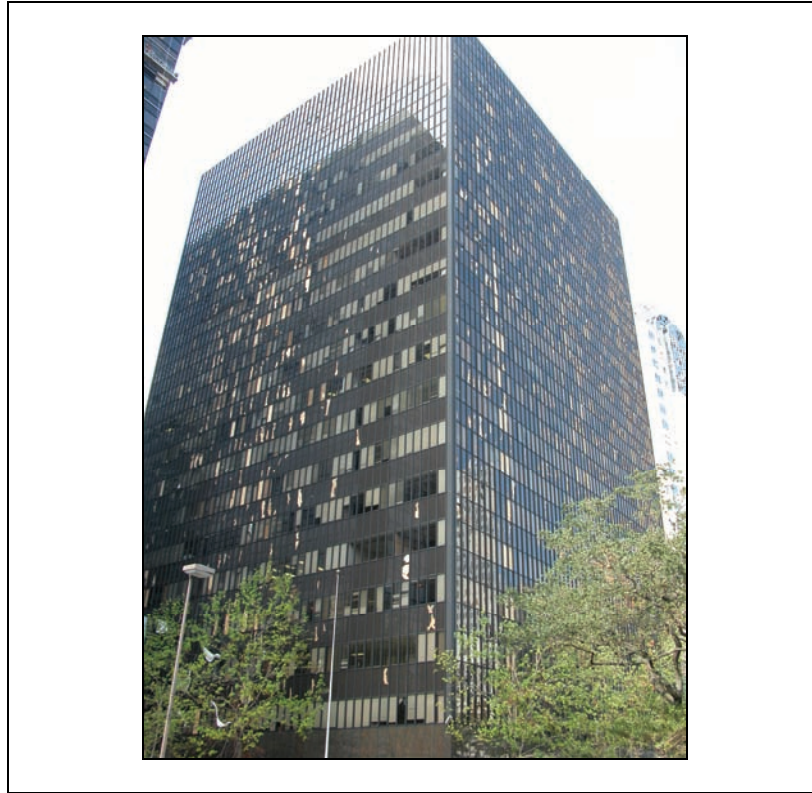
The Amoco building in New Orleans Business District had extensive window damage on the north and east facades and limited damage on other sides
